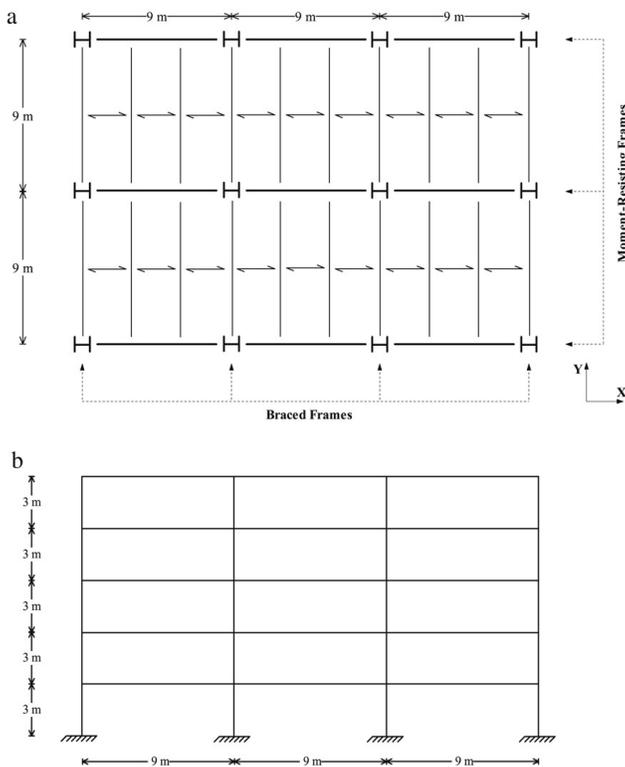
Structural arrangement for the reference structure: a) Plan configuration, (b) Elevation of moment-resisting frame.
